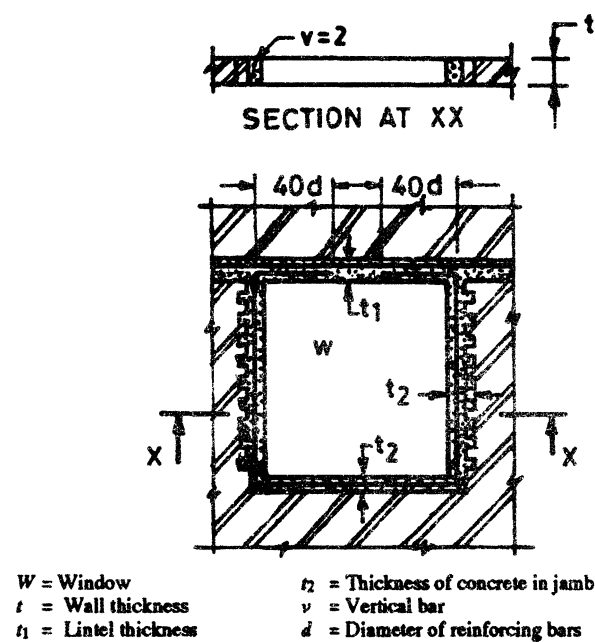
STRENGTHENING MASONRY AROUND OPENING
